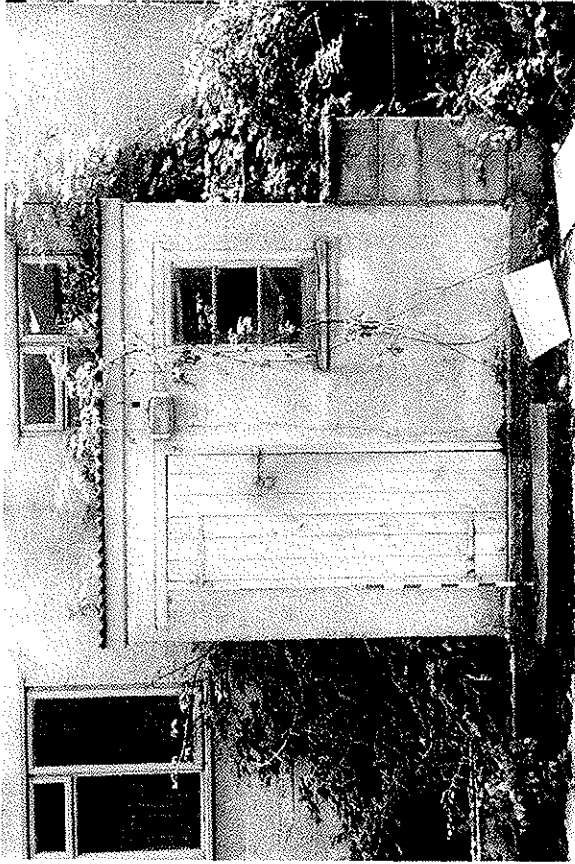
Flat-roofed store adjacent to workshop G (other features 6) This small building was also of cast *in-situ* concrete constructio. It was located facing onto the inlet dividing the north and south islands and appeared to have been associated with pumps for refuelling boats.
